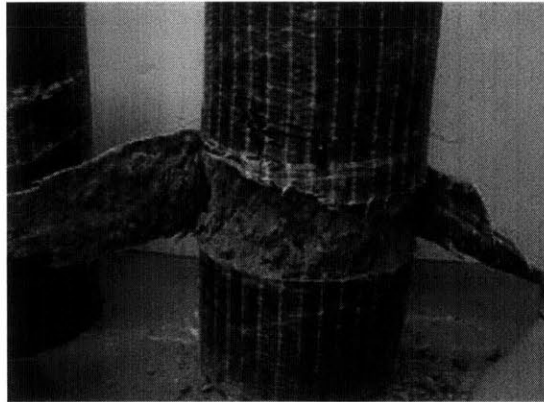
Localized damage zone in FRP-confined concrete (Au 2001)
